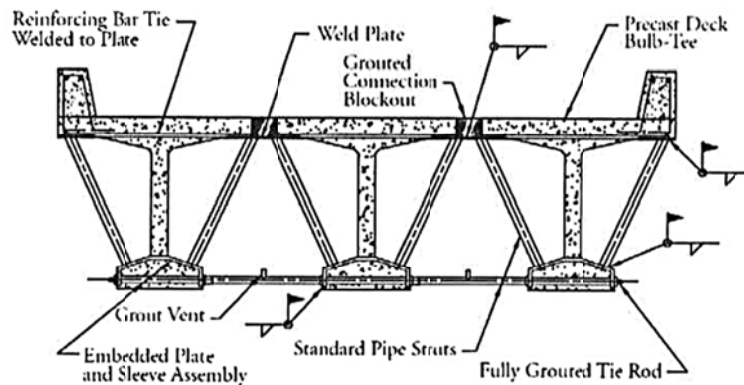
Secondary-Case, Precast Concrete Diaphragms (PCI 2011)
